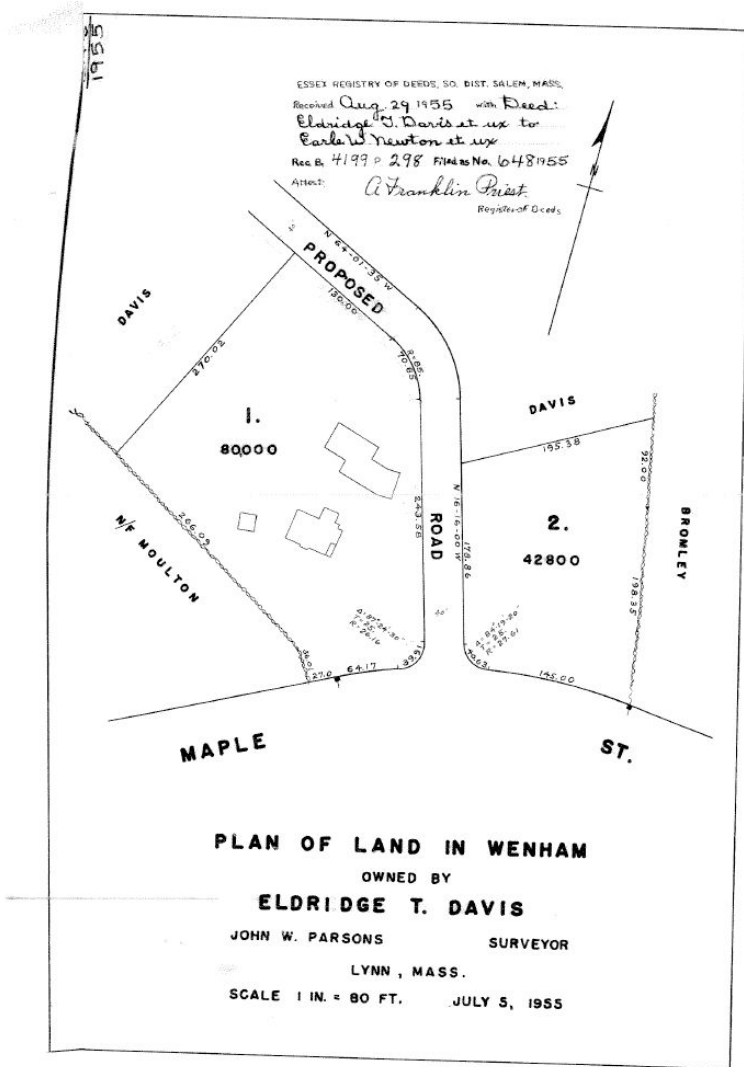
1955 site plan showing the house, North Kimball Barn and West Kimball Barn.¹⁰
